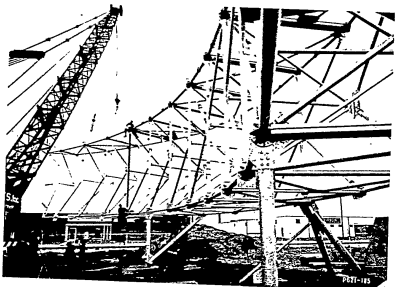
Left tipsection of reflector truss being bolted to the center section.
